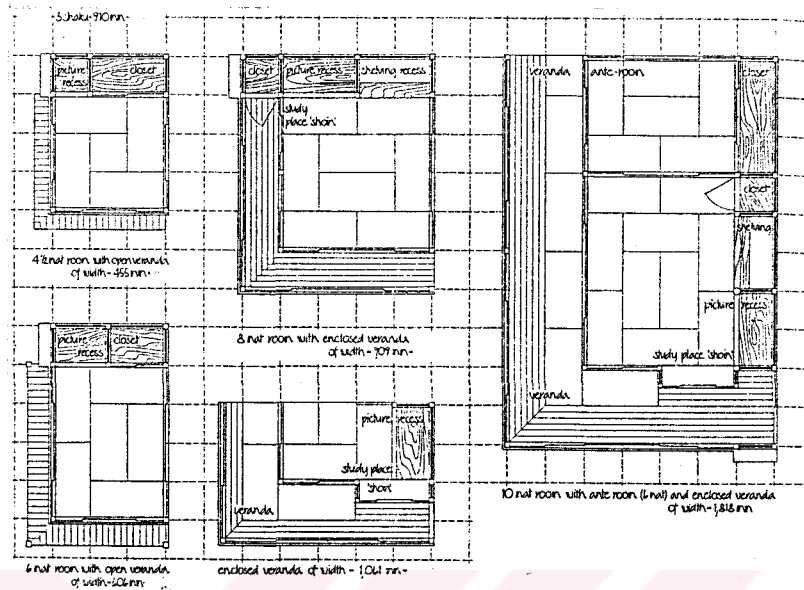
Generally used floor plans for reception room (Engel, 1964: 244)
